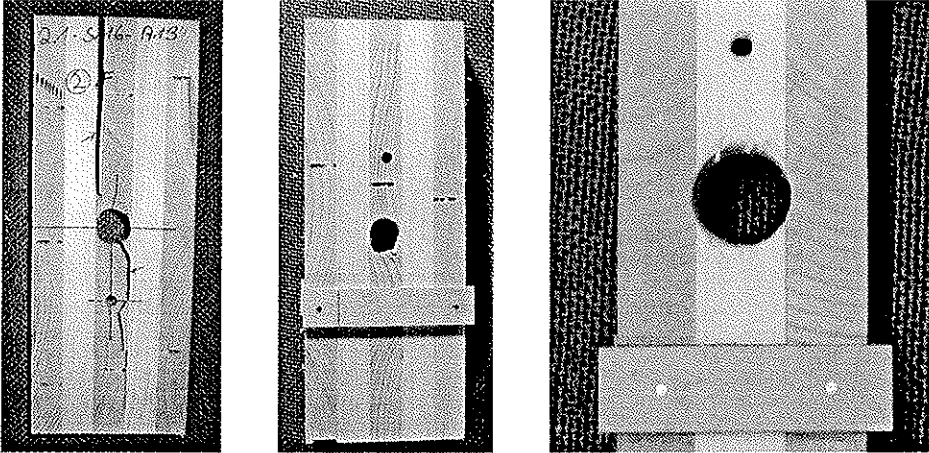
Splitting failure of test specimen and tensile reinforcements to avoid splitting
